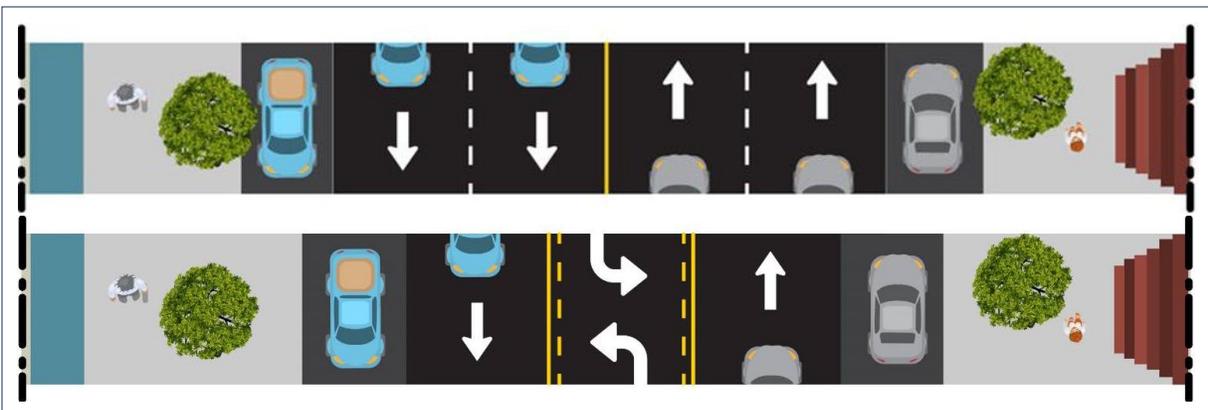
Top: Existing conditions on Main Street through downtown include two travel lanes and on-street parking with narrow sidewalks. Bottom: The Project will reduce travel lanes, allowing for wider sidewalks and on-street parking in the downtown retail/business district.
